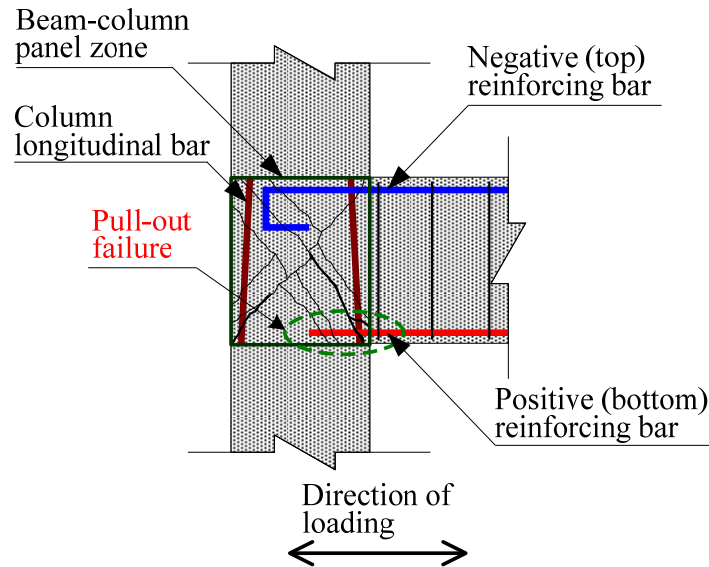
Failure for a typical non-ductile beam-column joint
